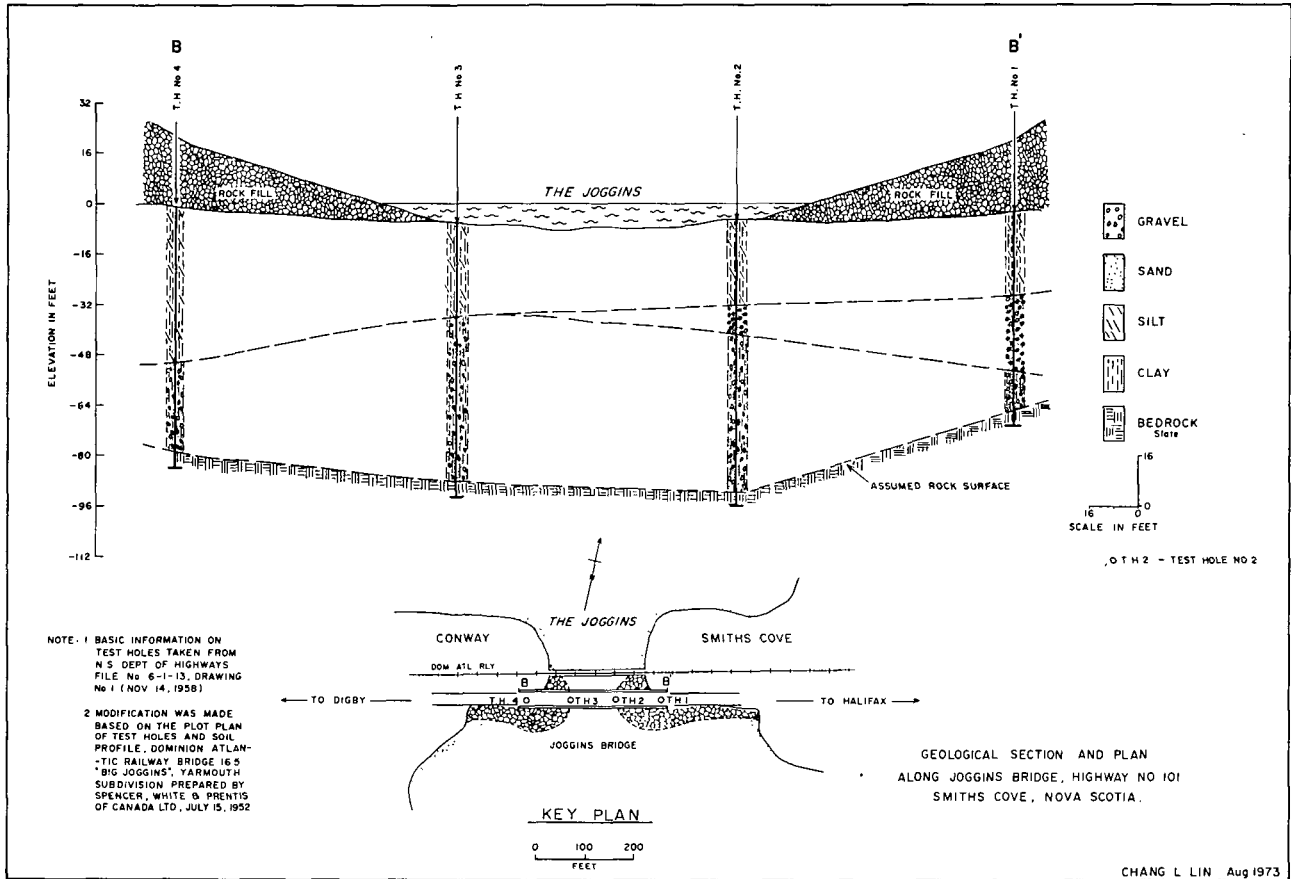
Geological section and plan along Joggins Bridge, Highway 101, Smiths Cove, N.S.
